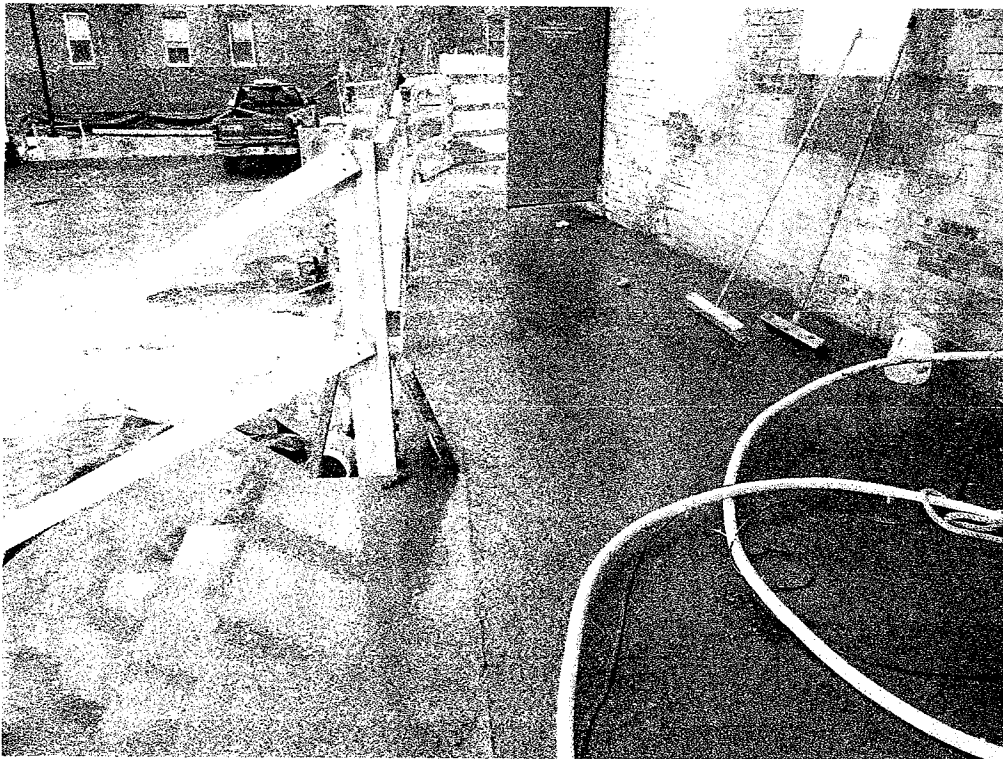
Rear entry concrete steps and sloped sidewalk installed.
